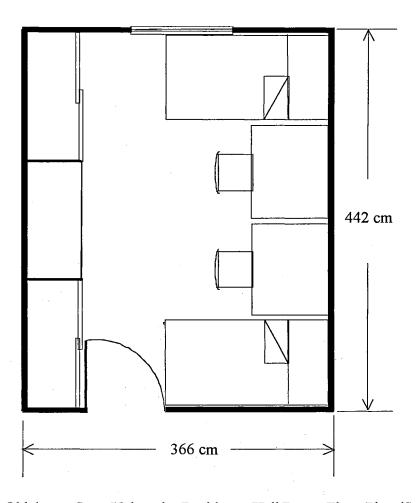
Oklahoma State University Residence Hall Room Floor Plan (Scale: 1/50).
